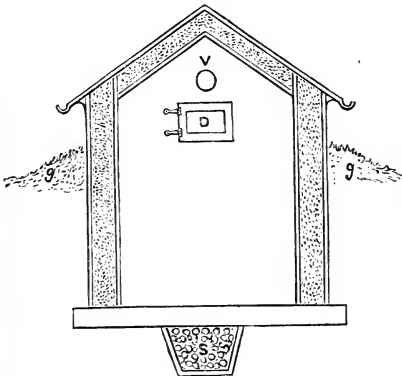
Vertical Section—V, Eight-inch Ventilator; D, Filling Door; g g, Ground Surface on upper side; S, Stone under centre for drainage.
